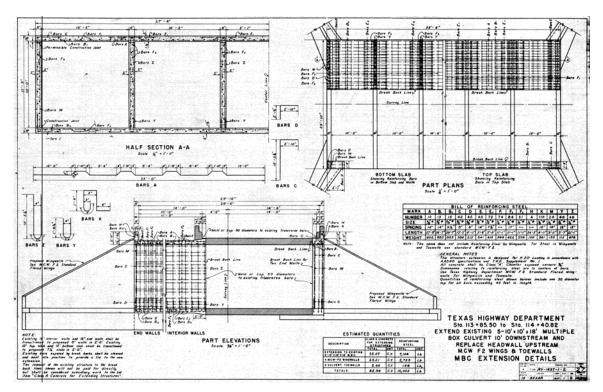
TxDOT Standard Category: Structure-specific design ('MBC Extension Details' for widening of 5 barrel, 10ft x10 ft)
